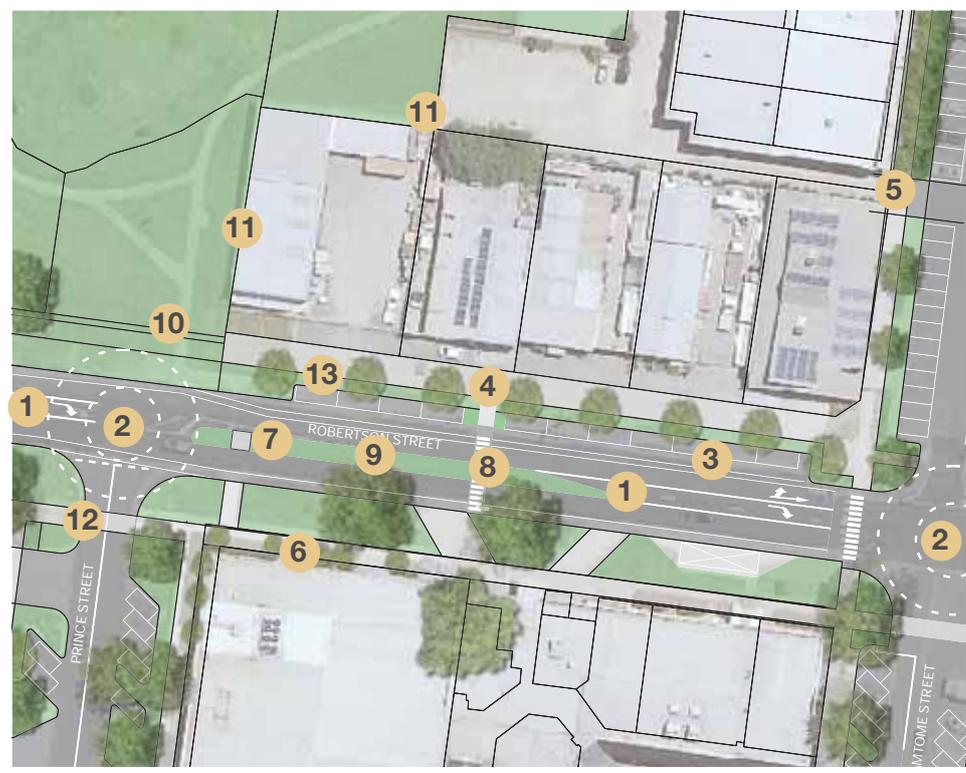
Robertson Street Concept Plan (between Prince & Brantome Streets)
